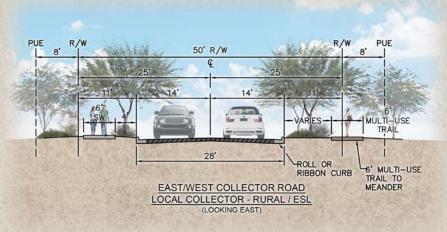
EAST-WEST COLLECTOR CROSS SECTION
